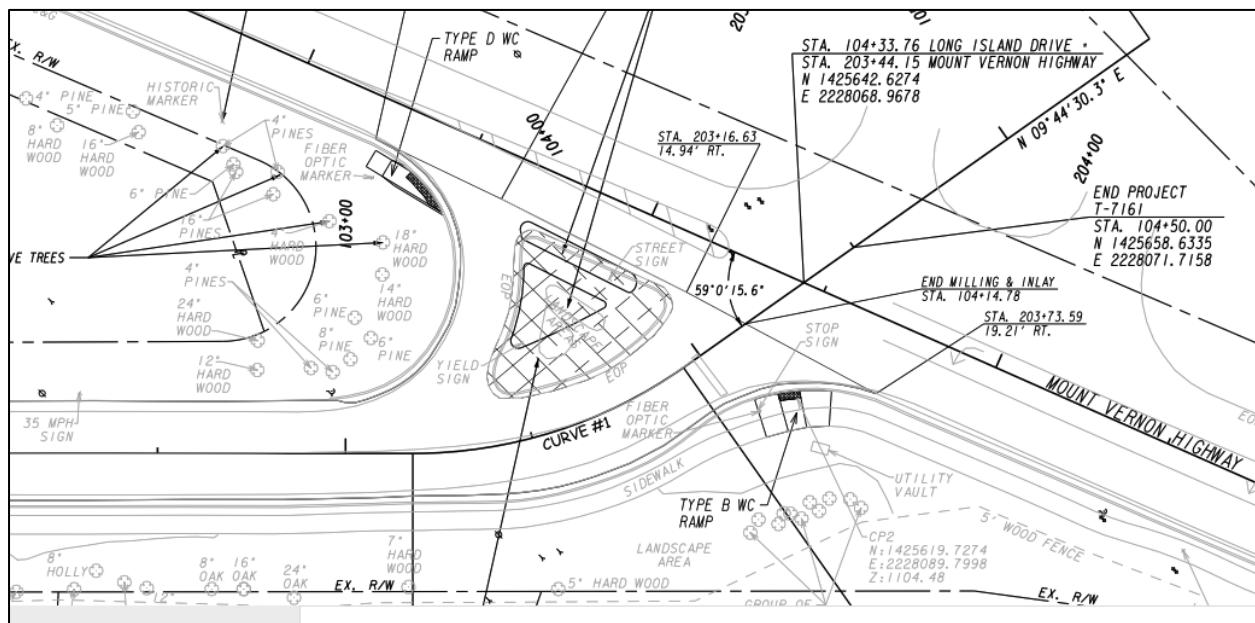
Construction Plan Sets 59 Degree Angle of Intersection
